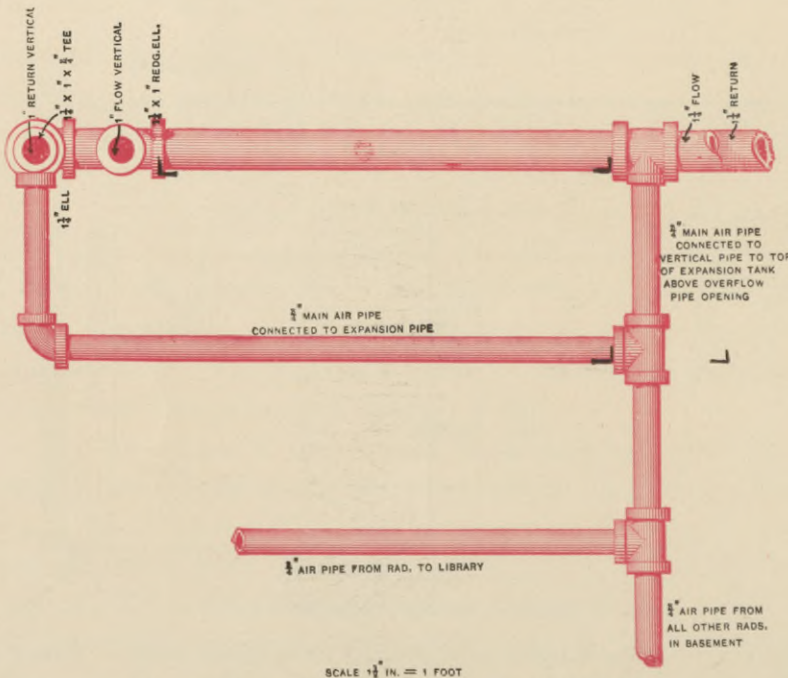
Flow and Return Pipes. Connection to Air Pipe at P.
